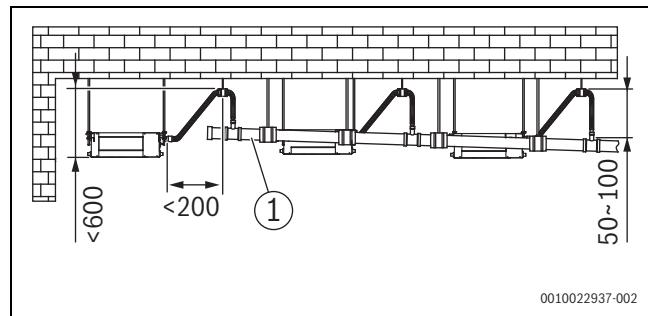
Installation and distances of water discharge piping with a water pump [mm]
